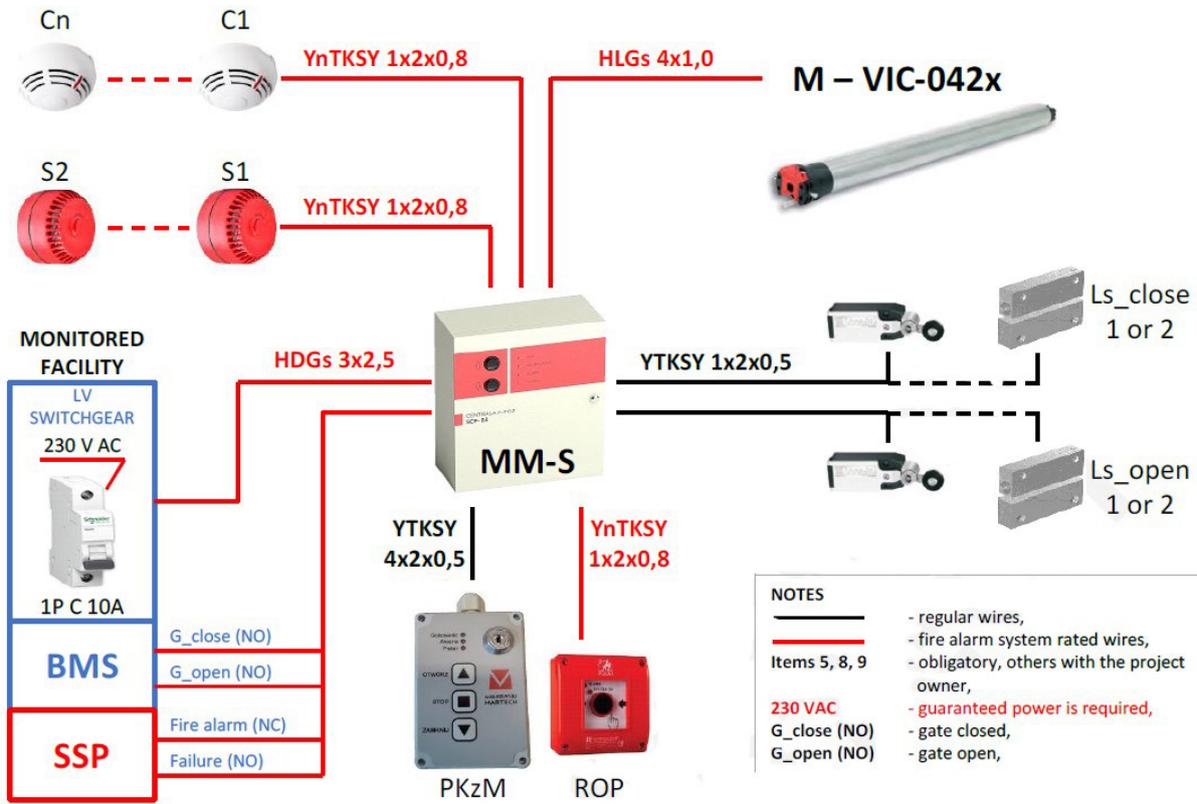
Icontrol system with internally-mounted 230 V AC drive unit (guaranteed power)
